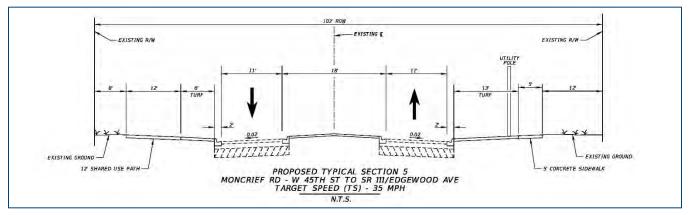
Proposed Typical Section (W. 45<sup>th</sup> Street to Edgewood Avenue)
